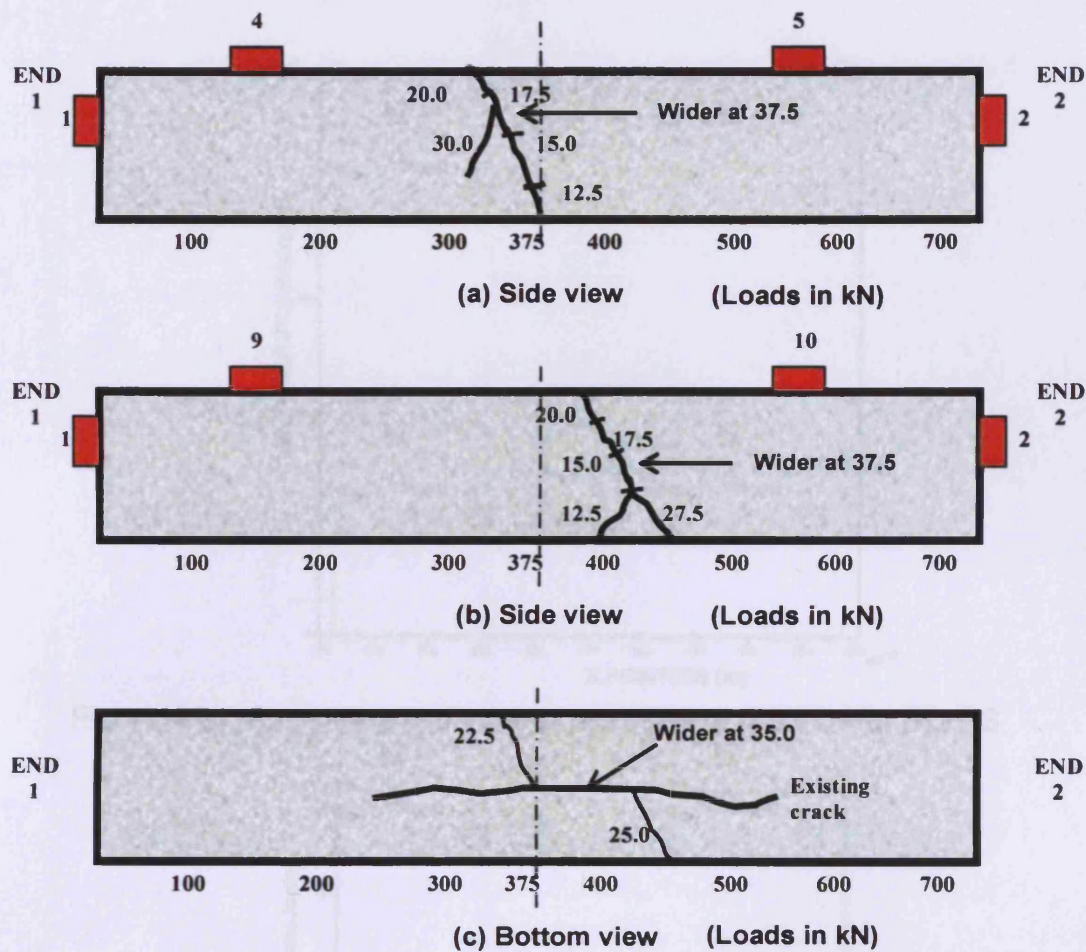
Crack pattern from visual observation for B22PS showing crack progressing with load in kN.
